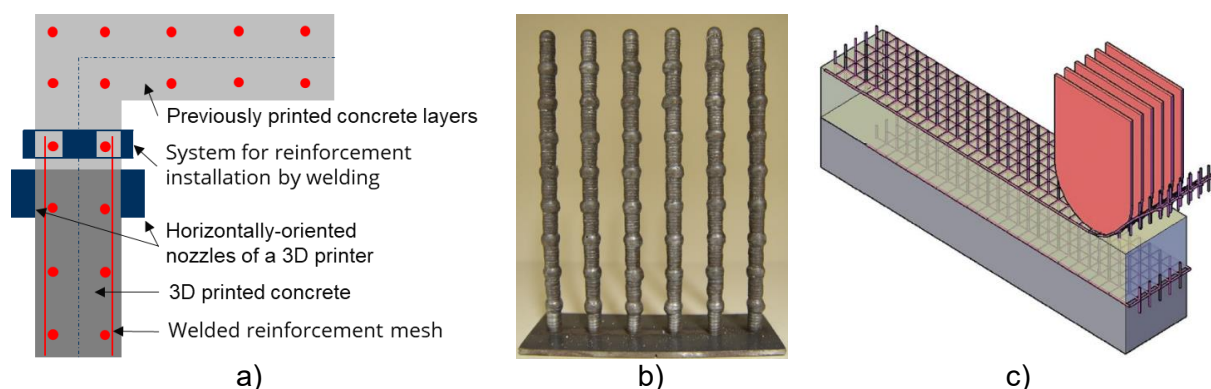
a) Principal process sketch for installing reinforcement by welding process b) 3D printed steel bars [39], and c) illustration of 2.5D textile laying process [44].
